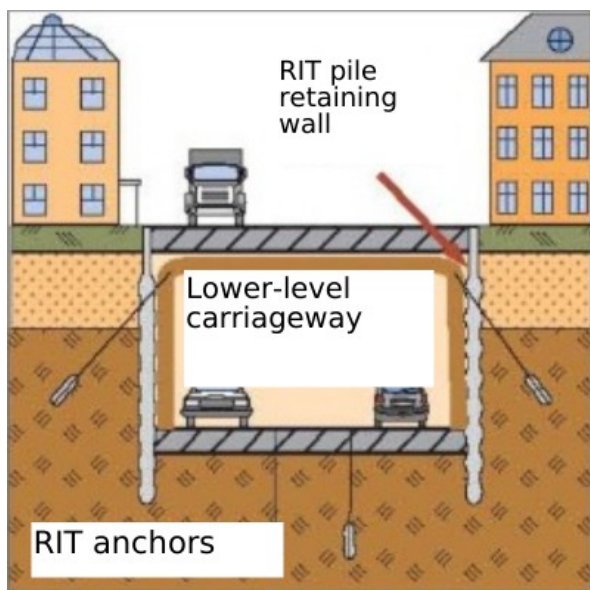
Two-level road interchanges. A RIT pile retaining wall supports the lower-level carriageway; RIT anchors restrain the wall.
